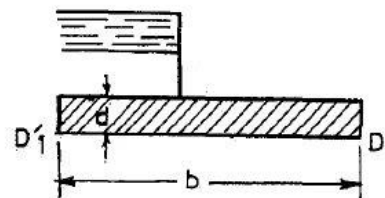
e. A straight horizontal floor depressed below the bed with no vertical cut off
